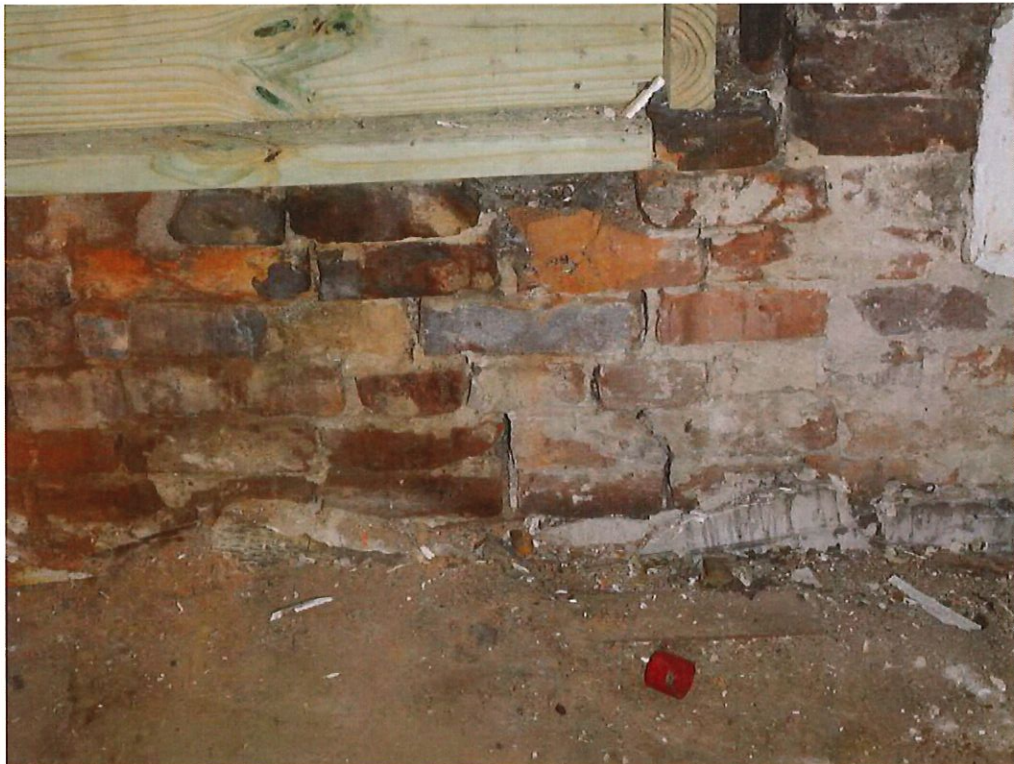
Cracked masonry beneath a replacement window installation on the upper floor.
